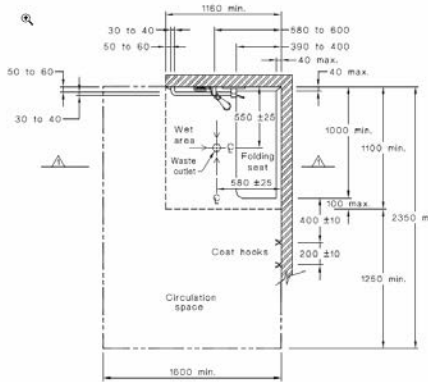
SHOWER RECESS FITTINGS—ELEVATION
